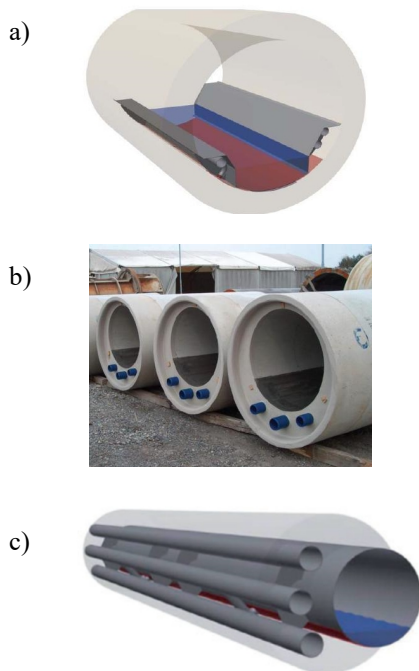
Types of heat exchangers for recovery of waste heat from the sewer outside of the building [3,4]
